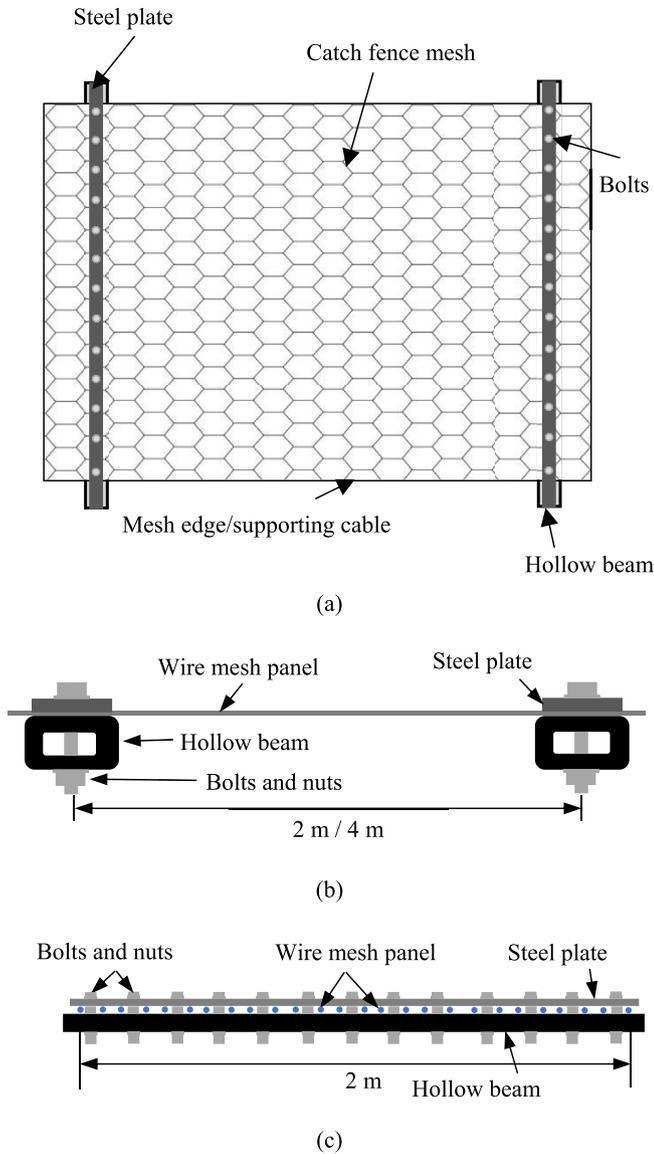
Illustration of the constraint for wire mesh panels in impact tests without supporting cables: (a) Top view, (b) Front view, and (c) Side view.
